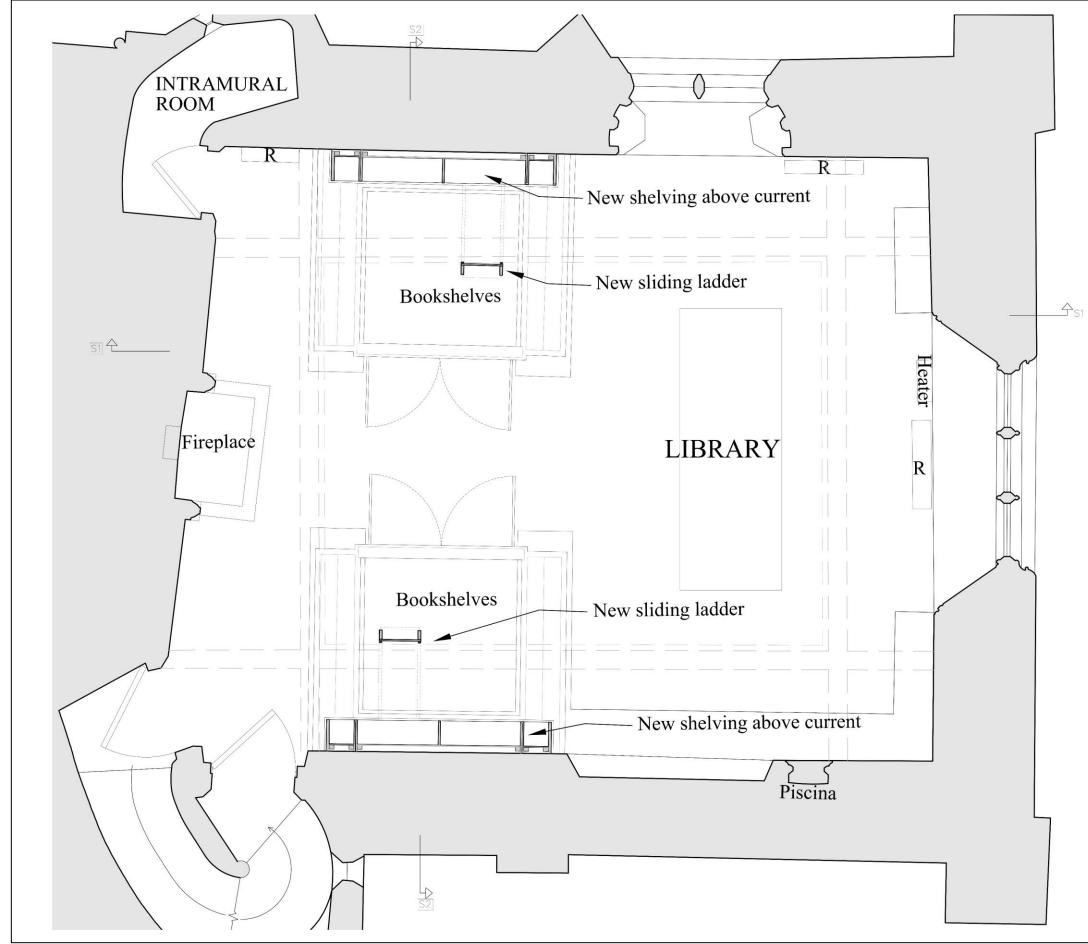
Extracted Floor Plan – St Davids Cathedral – Library New Shelving Plans. © Caroe & Partners Architects
